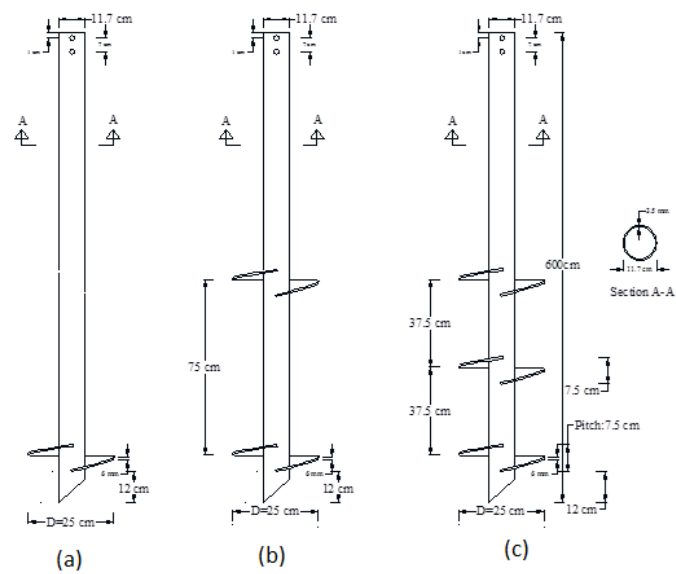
Typical test helical piles configurations, a) single helix pile; b) double helix pile; c) triple helix pile
